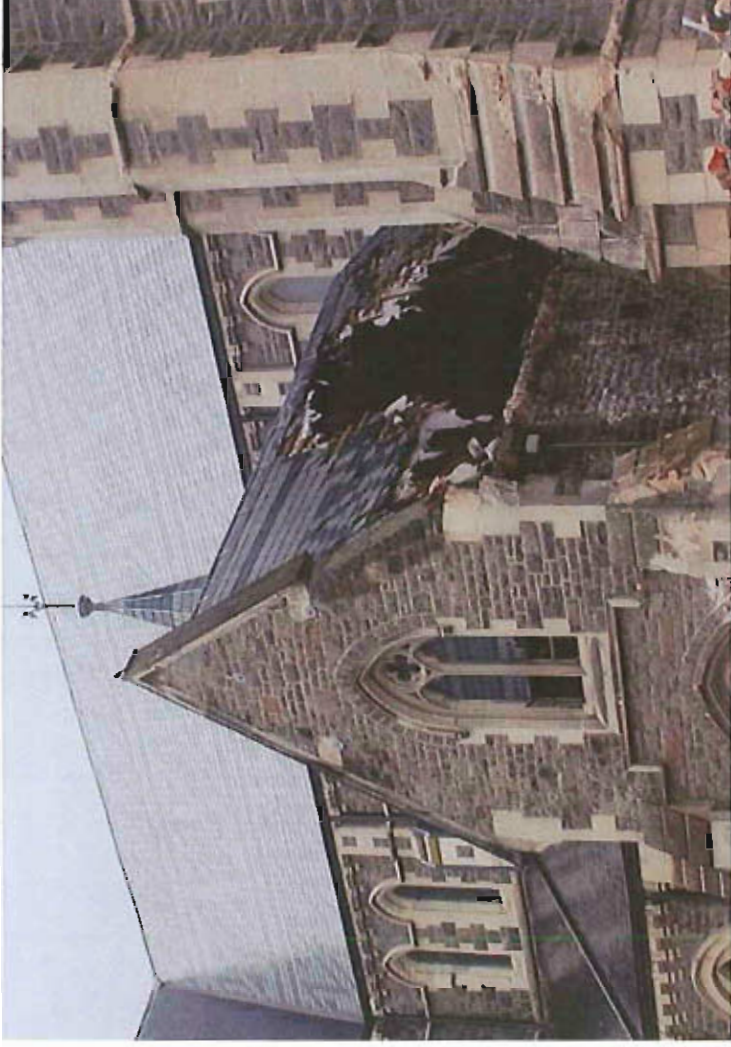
The north porch roof coverings – a principal area of damage to the roof slates.
